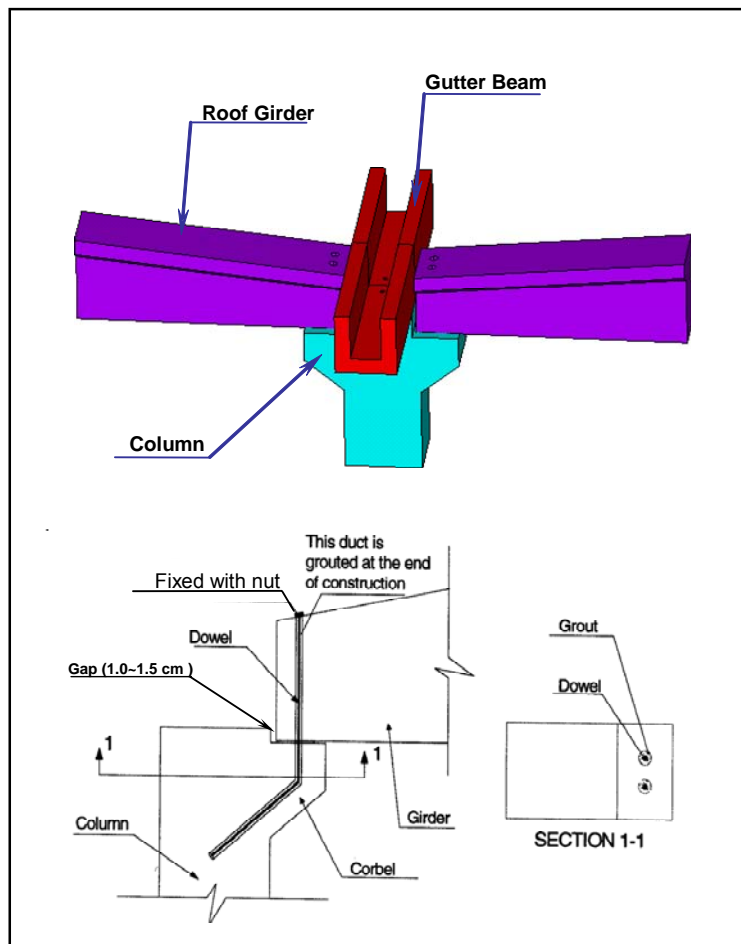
Details of a Typical Column-Girder Connection (Posada, 2001)
